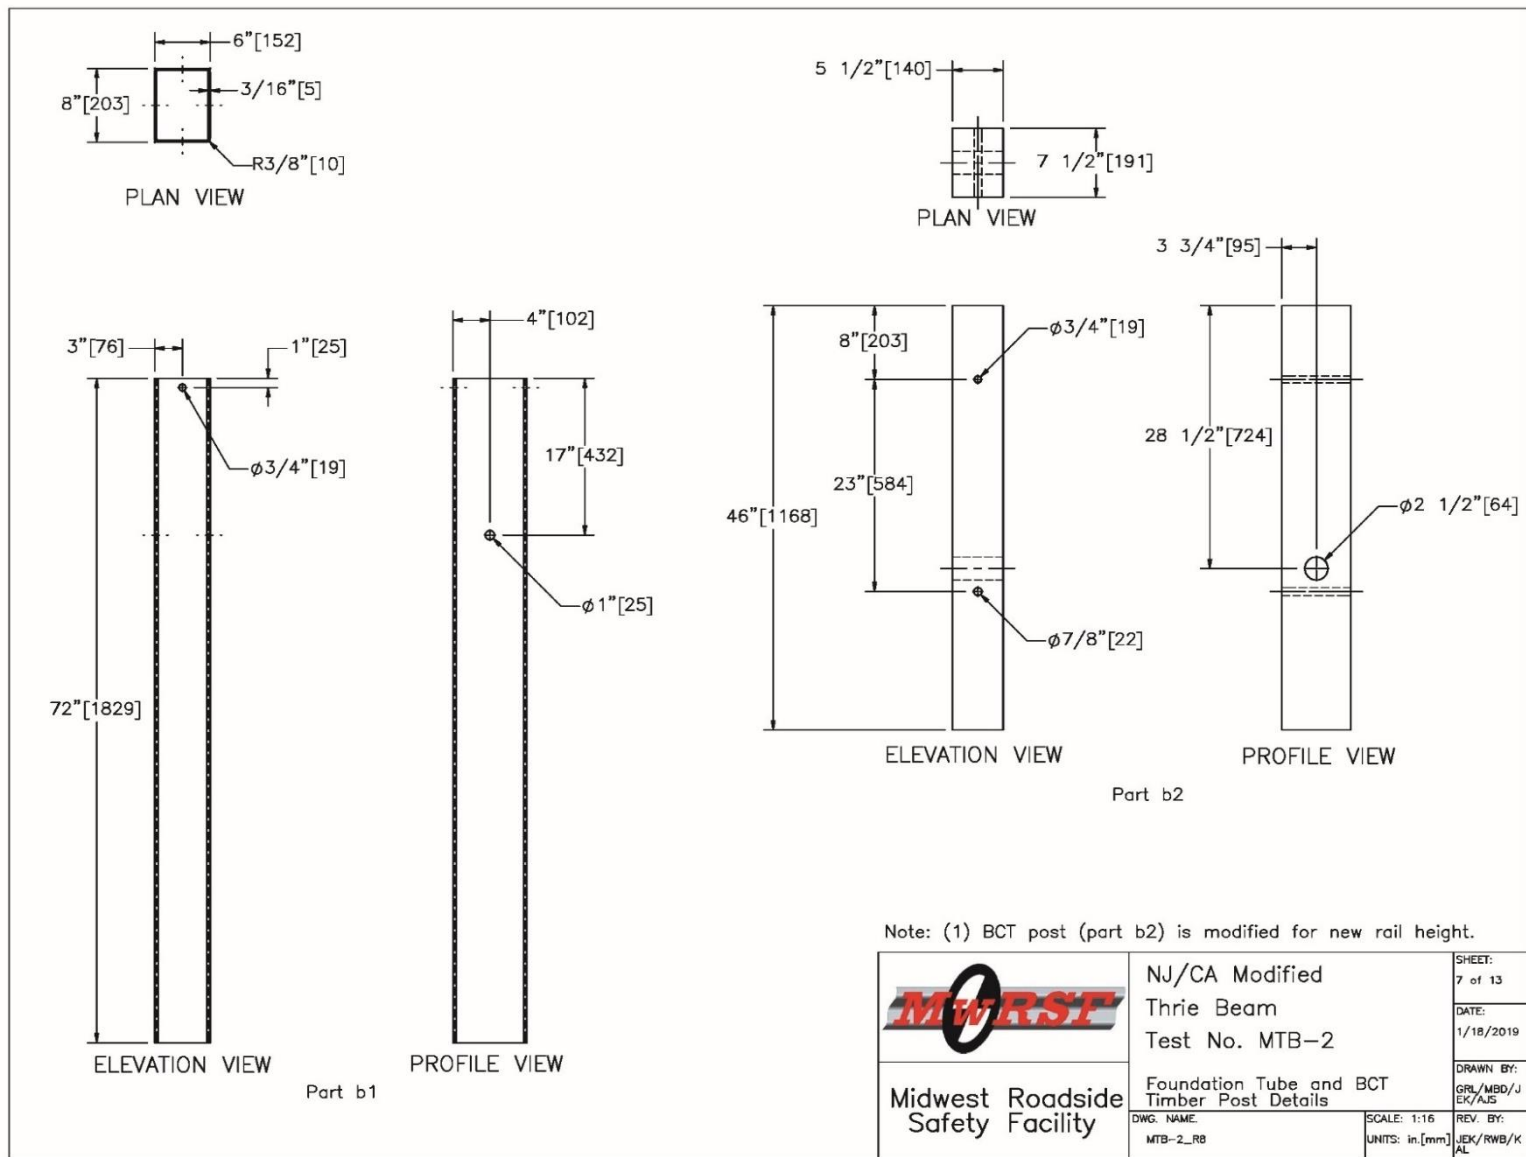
Foundation Tube and BCT Timber Post Details, Test No. MTB-2
